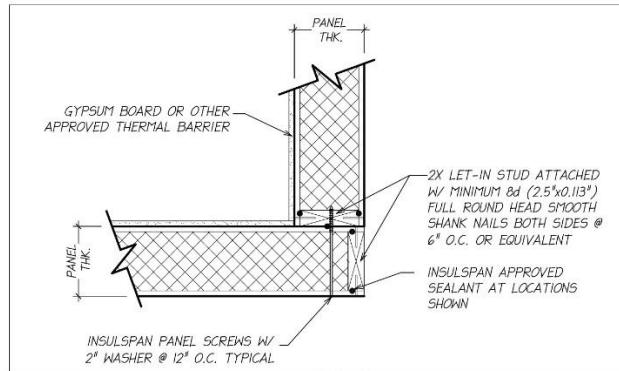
SIP Wall Corner Detail. Source: Insulspan
